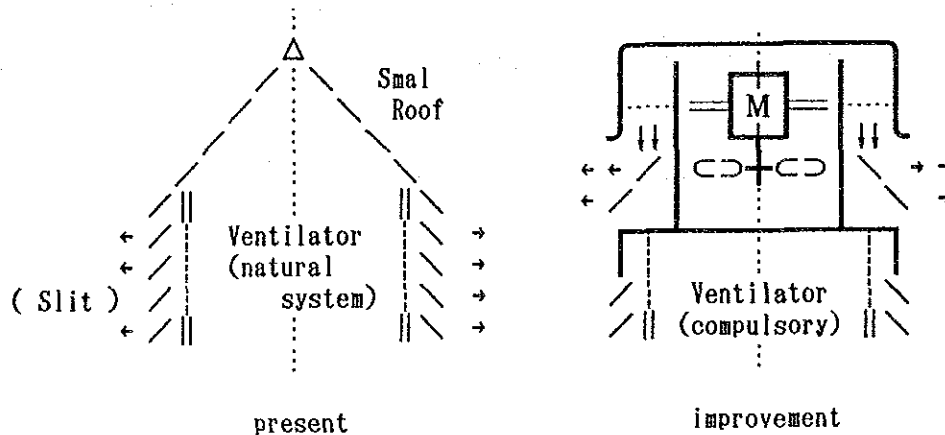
Installatyon Plan of Electrically-Driven Roof Ventilators
